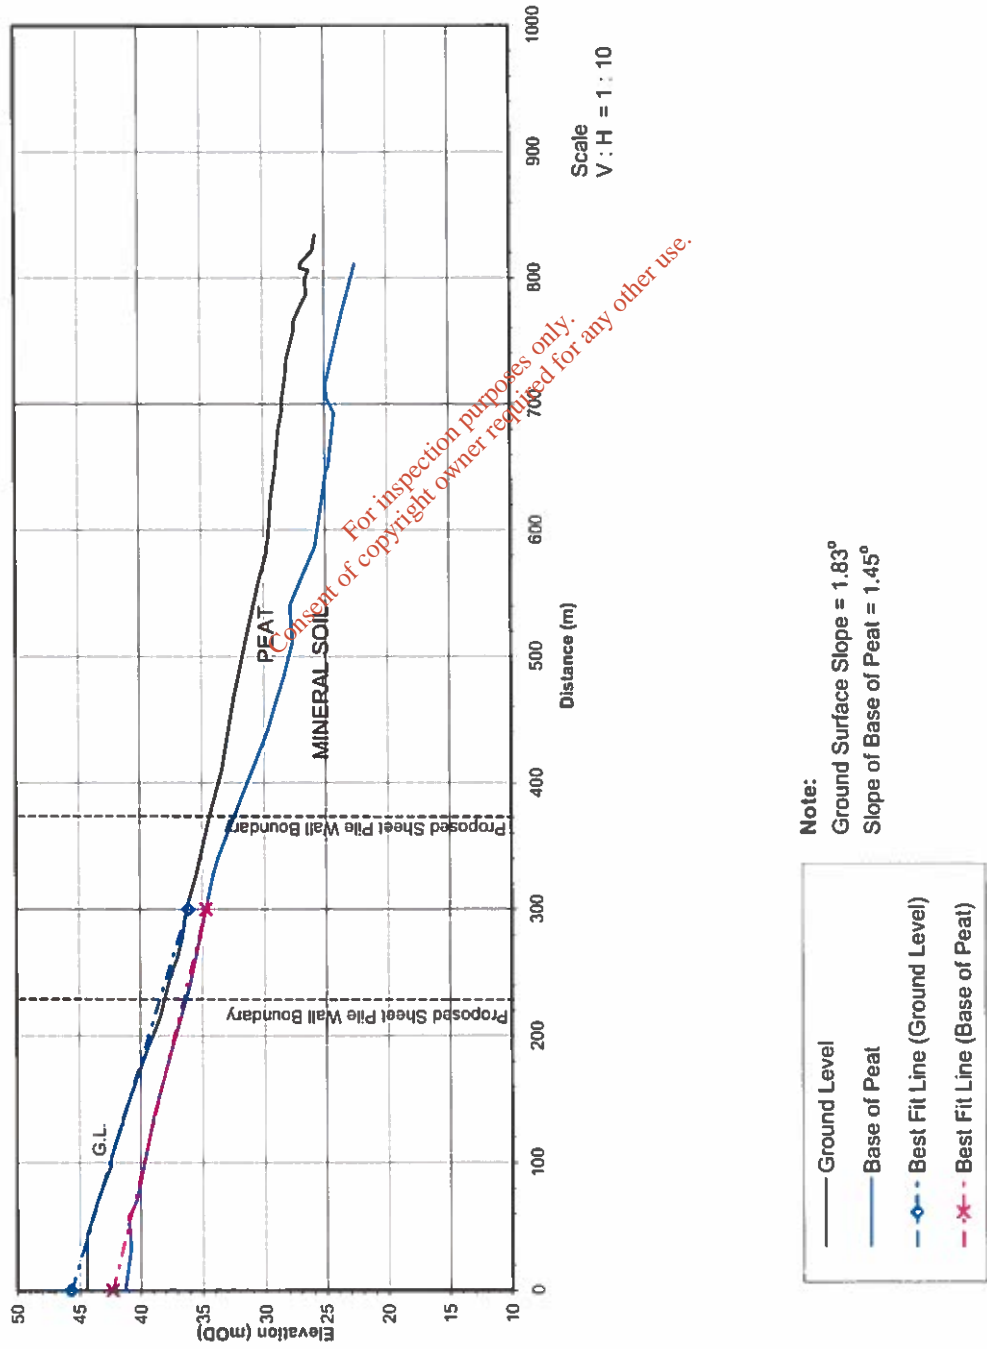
Typical Cross-section along Eastern Area and Temporary Construction Facility (Cross-section 4)
